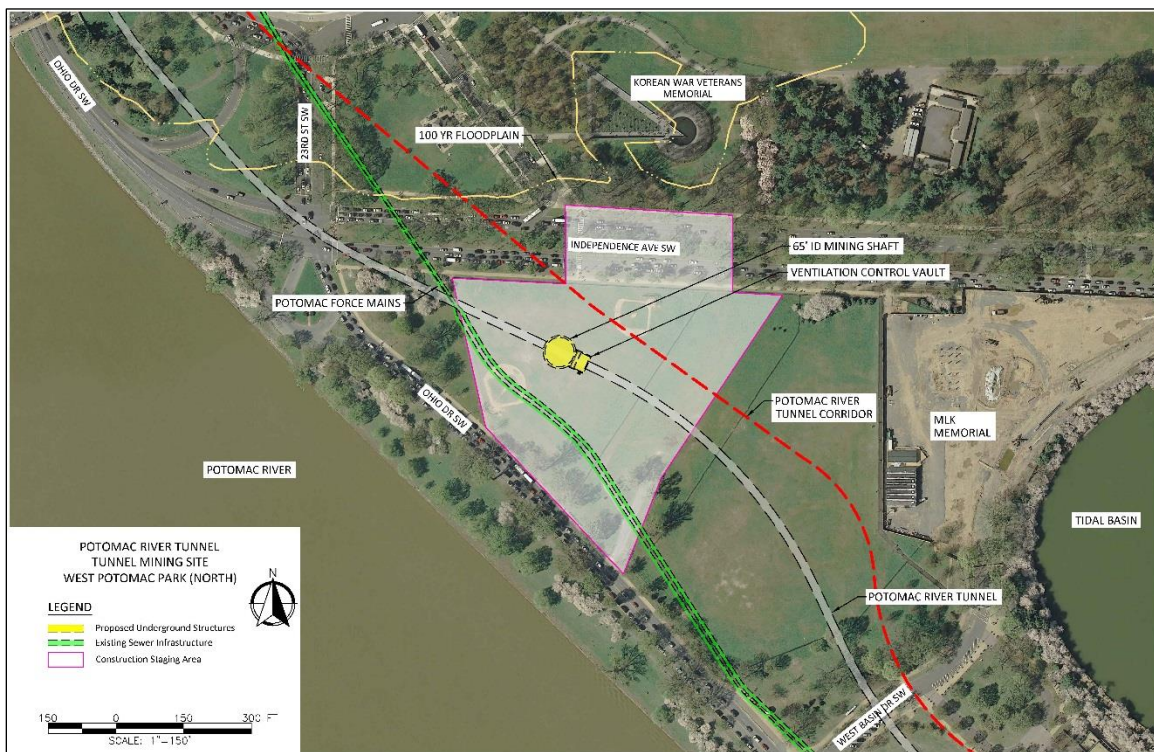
Tunnel Mining Site Option 1 – West Potomac Park (North)
